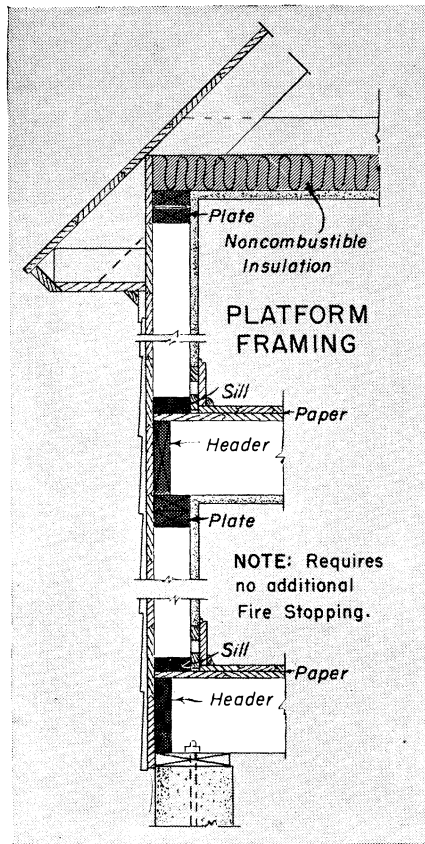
In platform framing the sills and plates close the spaces between studs and act as fire-stopping.
